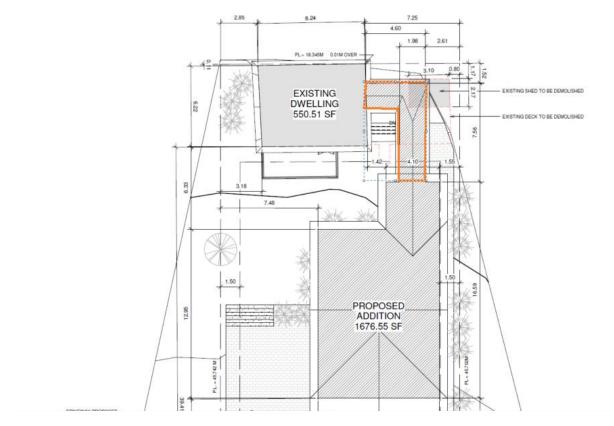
Excerpt from the site plan, showing the breezeway outlined in orange
